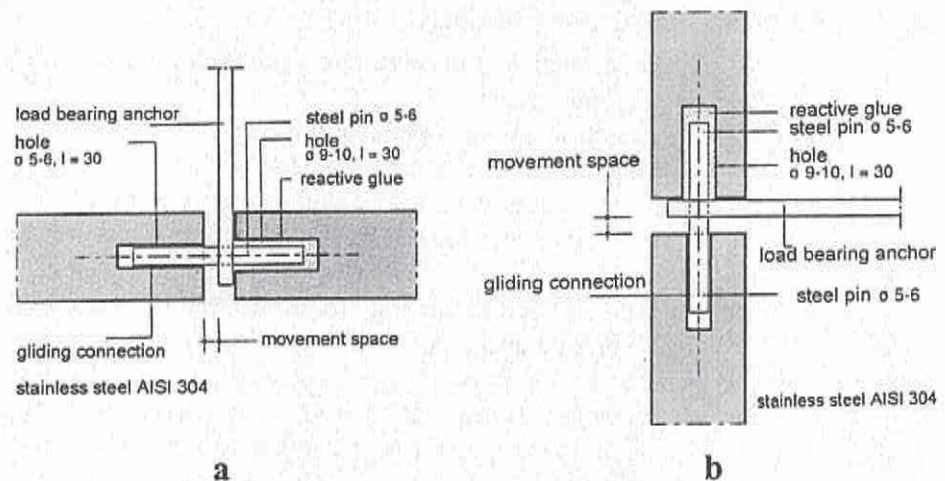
Connection between stone panel and the fixing anchor. Vertical fixing (a), horizontal fixing (b).
